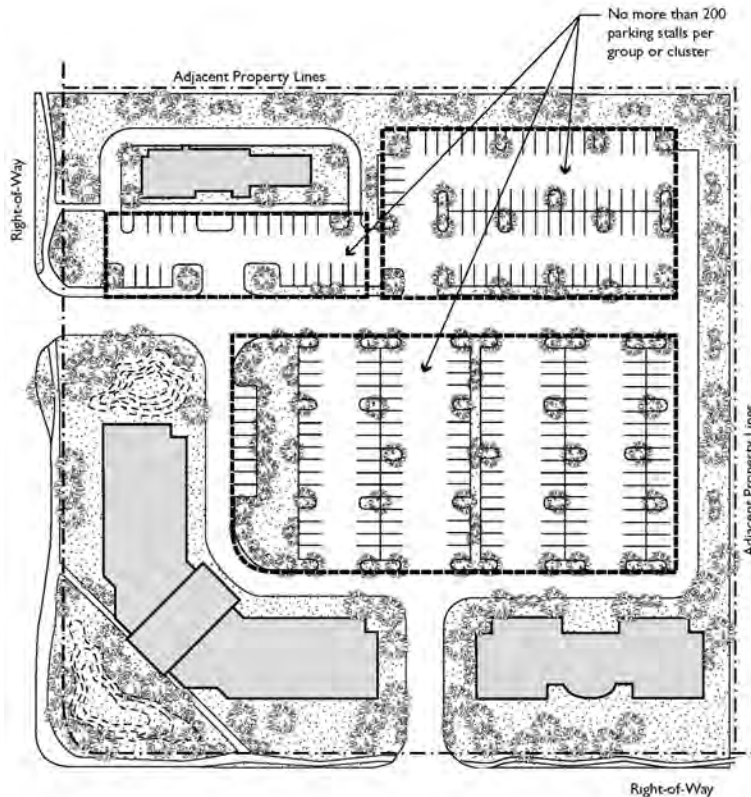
H.2.E: PARKING LOT LAYOUT
